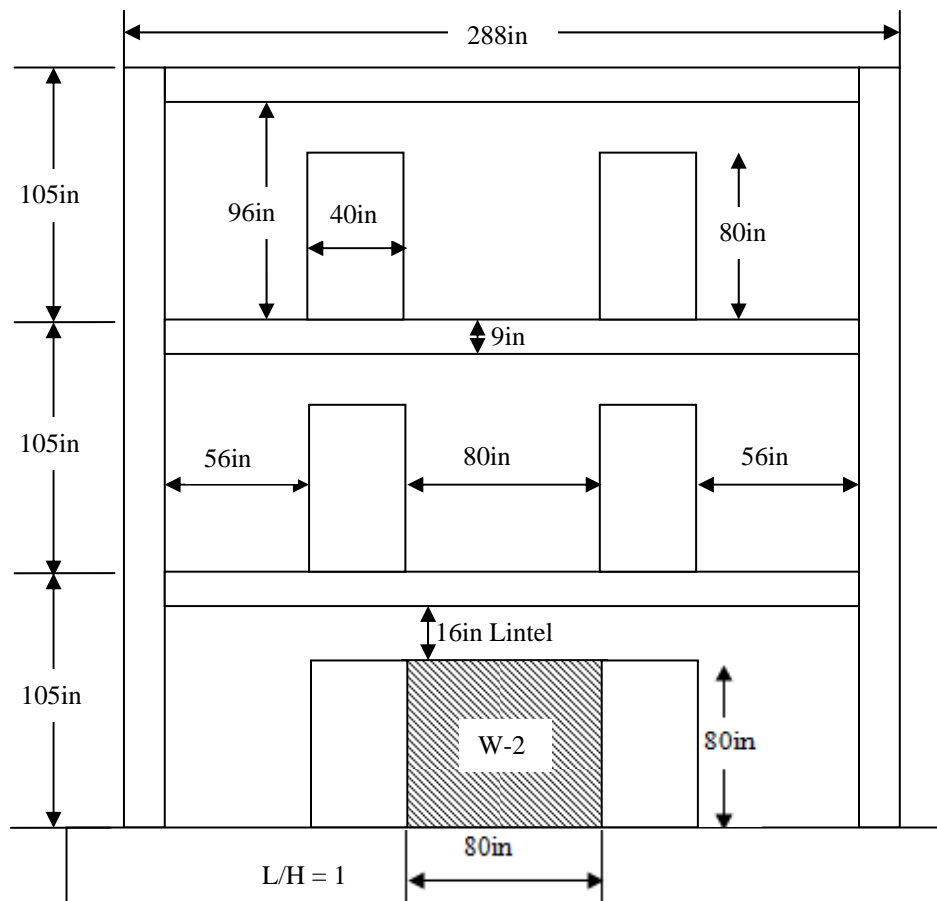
Elevation view of the three-story specimen. Masonry wall W-2 is shown.
